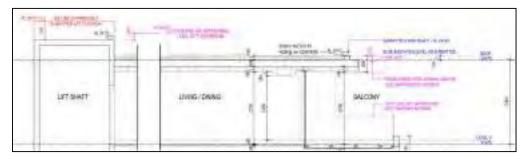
Upper section plan showing new roof height (150mm lower than submitted plans) and lower lift overrun than submitted (reduced 700mm) to RL25.17m
